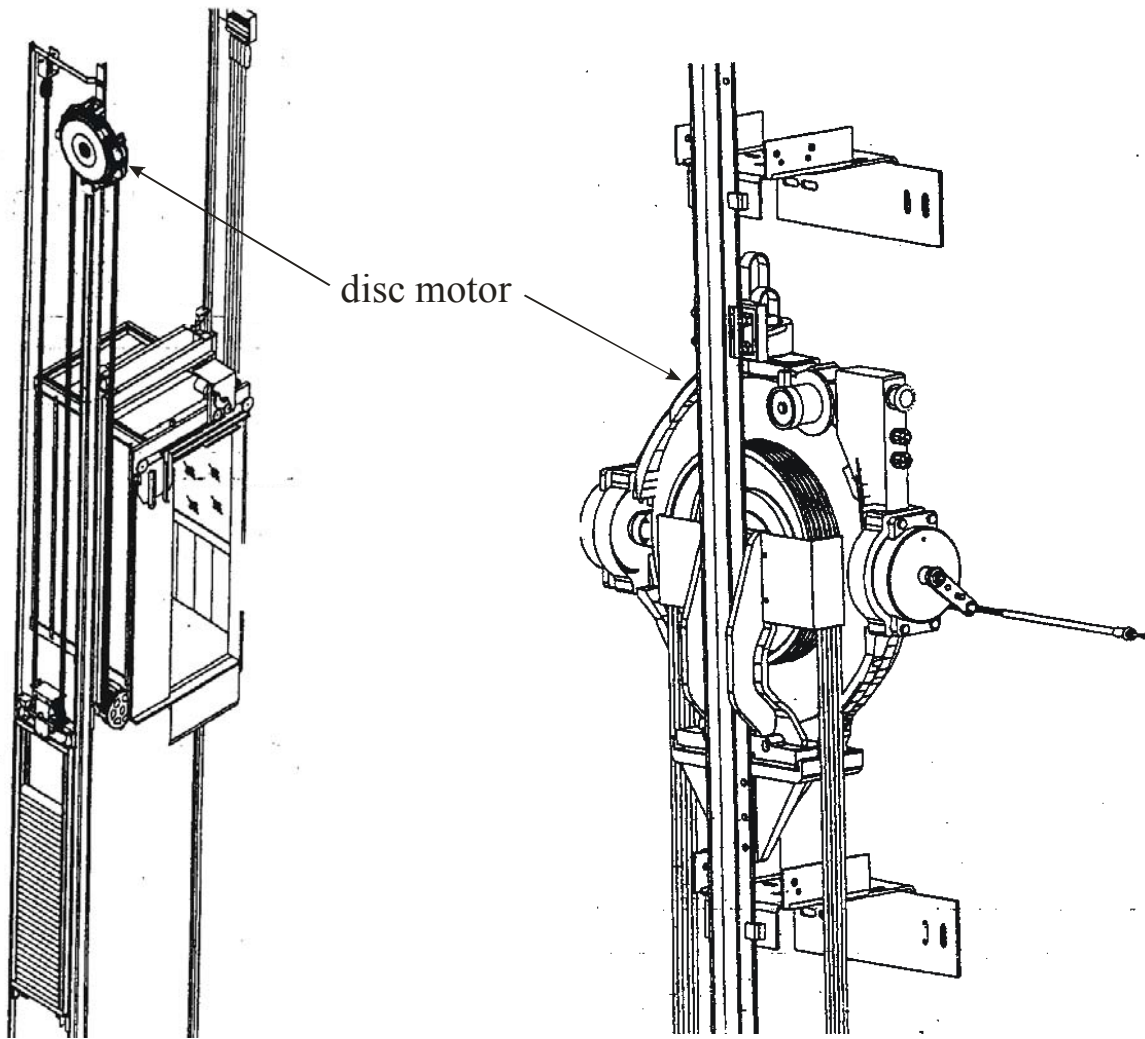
Elevator with the drive placed aside the cabin [2]
